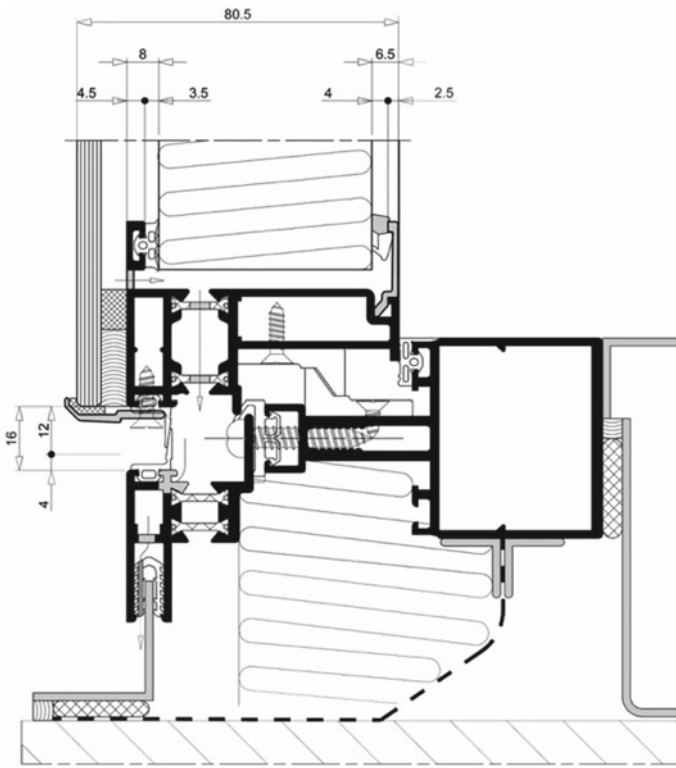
Construction of the transom at the extrados interface that involves the assembly of the rear connection plate towards the deck structure, with silicone gasket and sealing, the application of the internal waterproofing sheathing (by grafting two corner profiles onto the lower surface of the tubular section), the assembly of the front connection plate. © Courtesy of Metra
